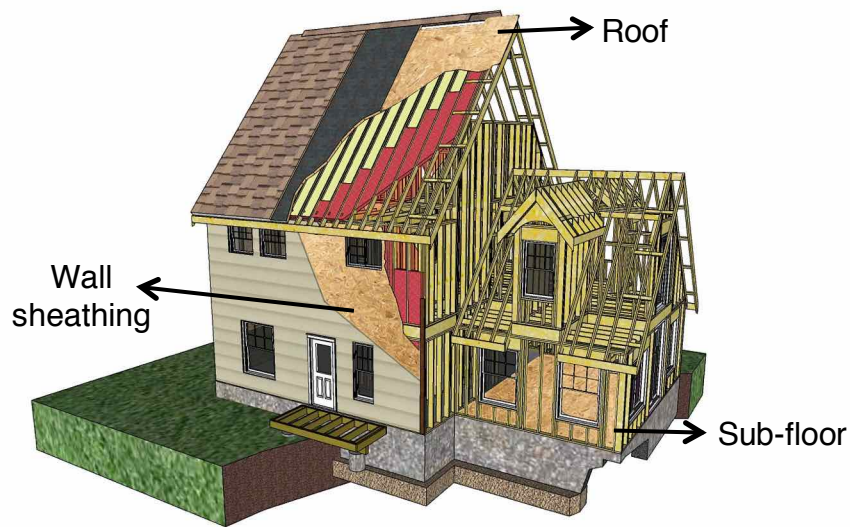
Computer-generated image showing the main uses of OSB in housing; wall sheathing (arrowed left), roof (arrowed centre) and sub-floor (arrowed right)
